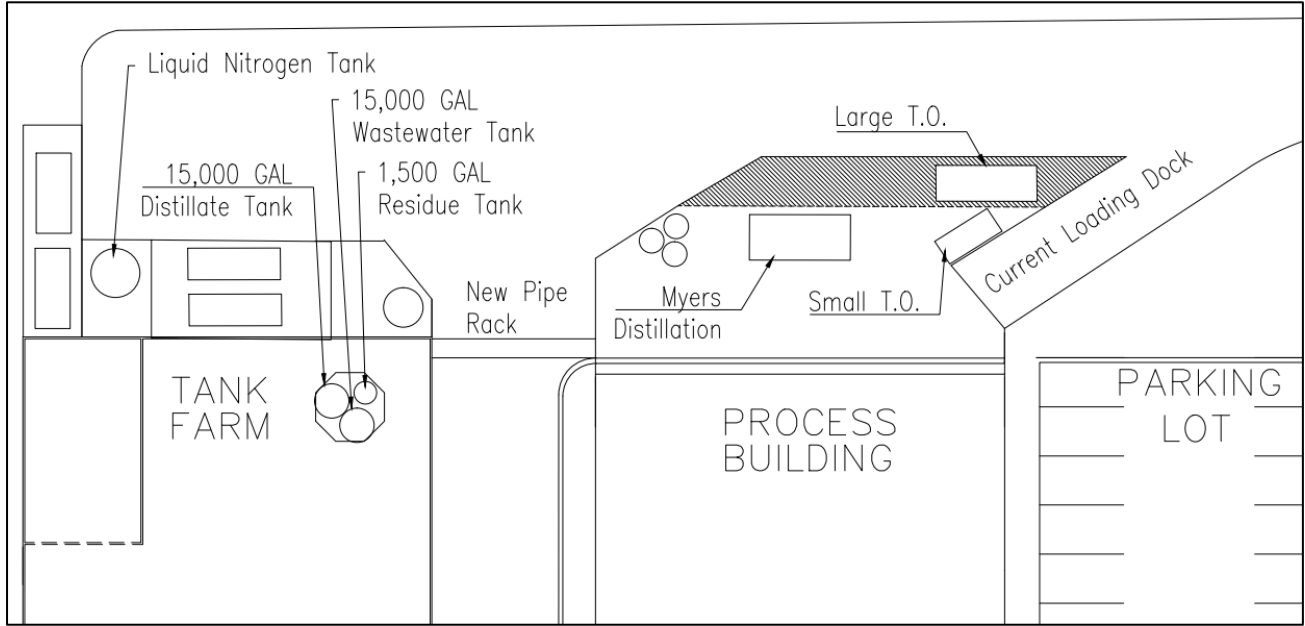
Proposed Site Plan for Distillation Systems at Ever Cat Fuels
